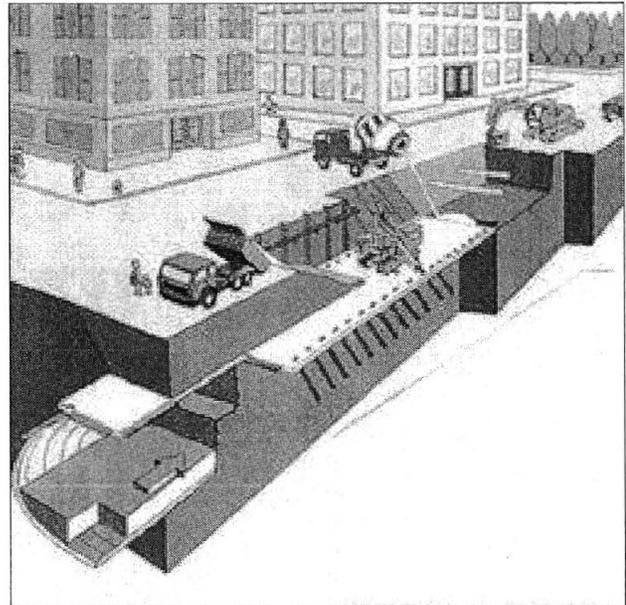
Doorframe Slab (DFS) Tunneling Method
